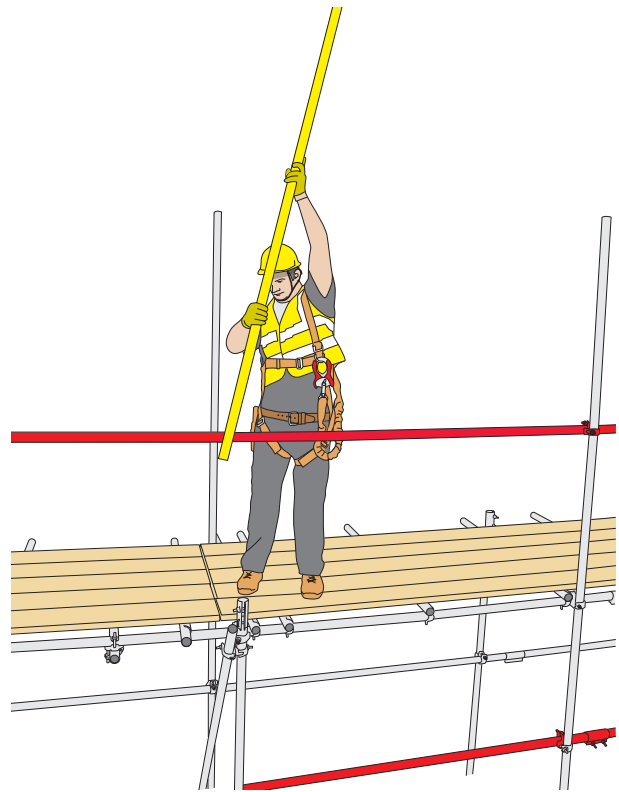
Illustration shows a scaffolder hemping a standard over a guardrail.
